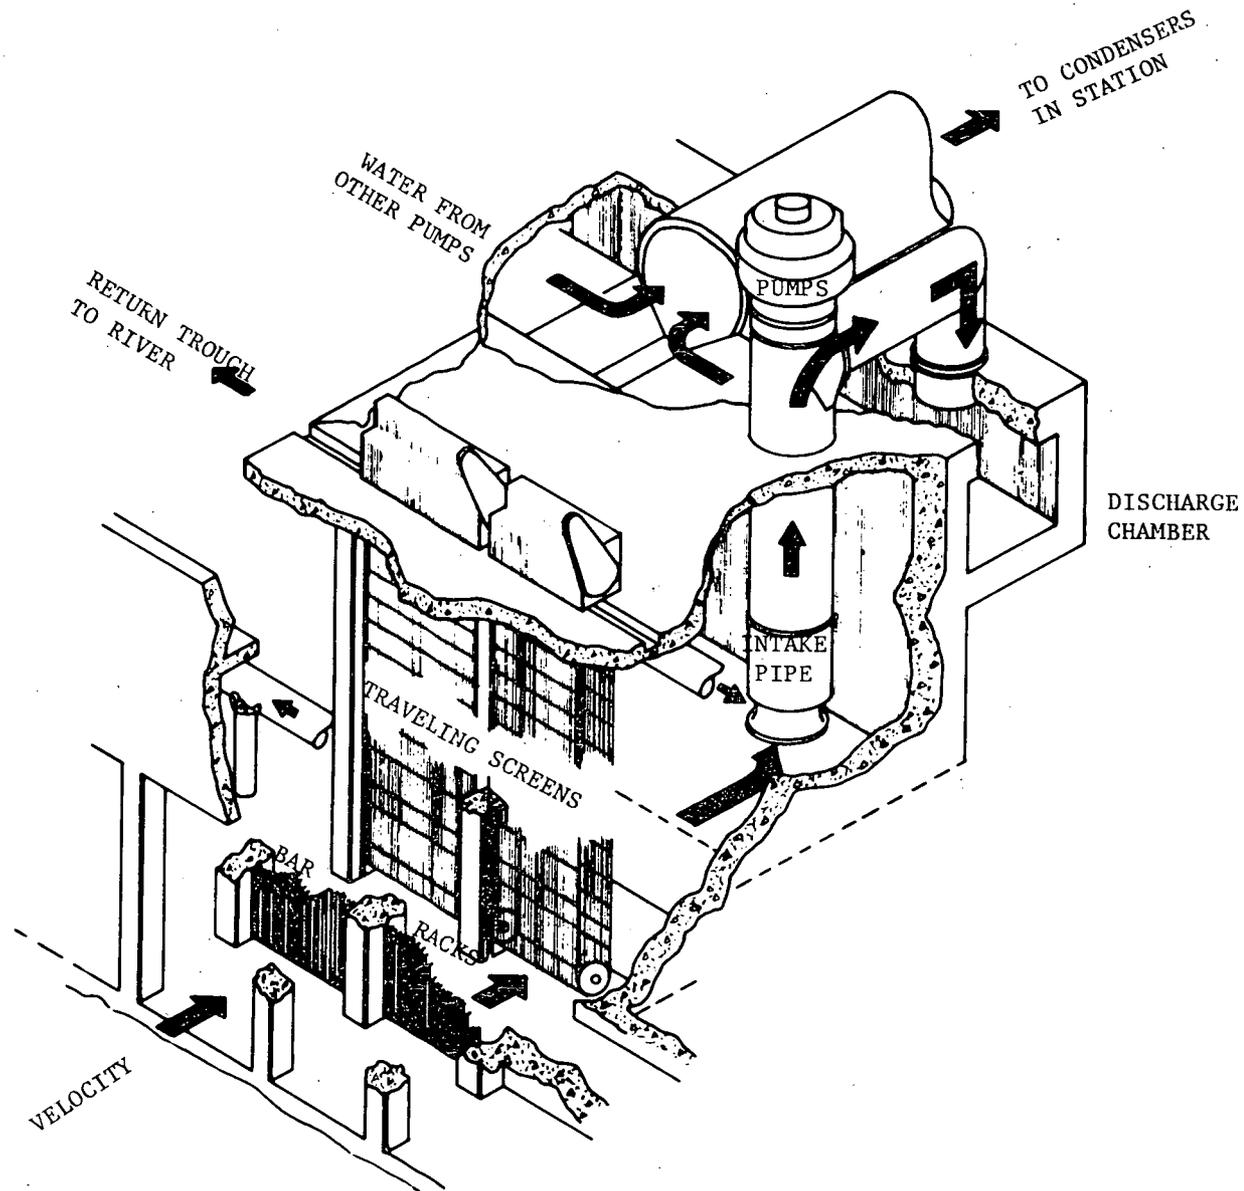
Detailed Schematic of Roseton Generating Station Intake Profile
